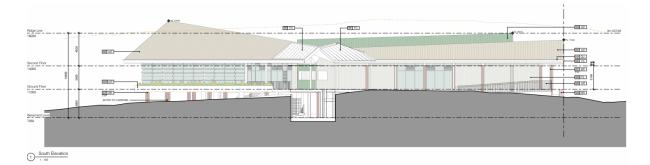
The South Elevation, being the highest point of the site, shows minimal variation from the standard, with only a small section of roof line on the Western side above the 9m Datum line (shown as an orange dashed line).
